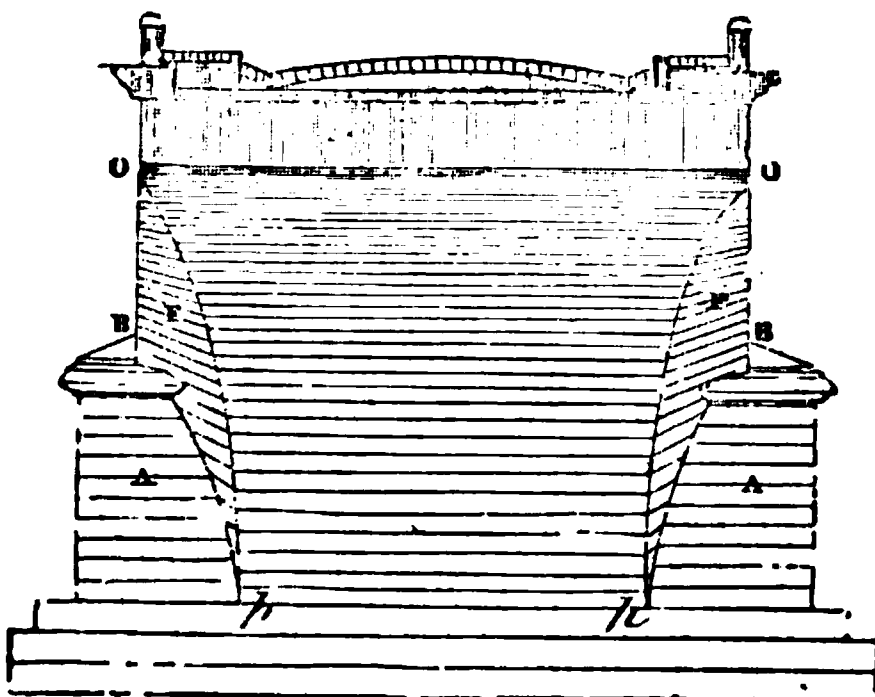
Represents a cross section and elevation through the crown of Fig. 182, showing the arrangement also of the roadway, footpaths, parapet, and cornice.
